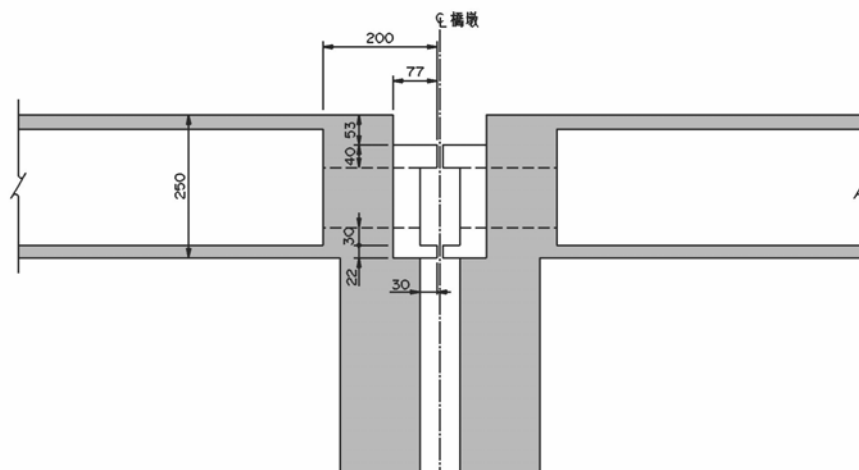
Longitudinal section of full-rigid-frame type viaduct (2/2)
